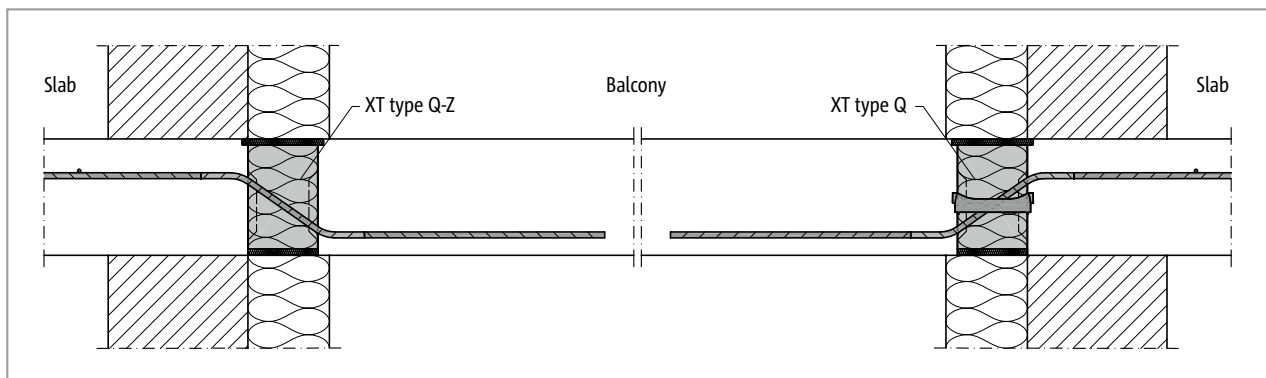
Schöck Isokorb® XT type Q, Q-Z: Application case single direction tensioned reinforced concrete slab
